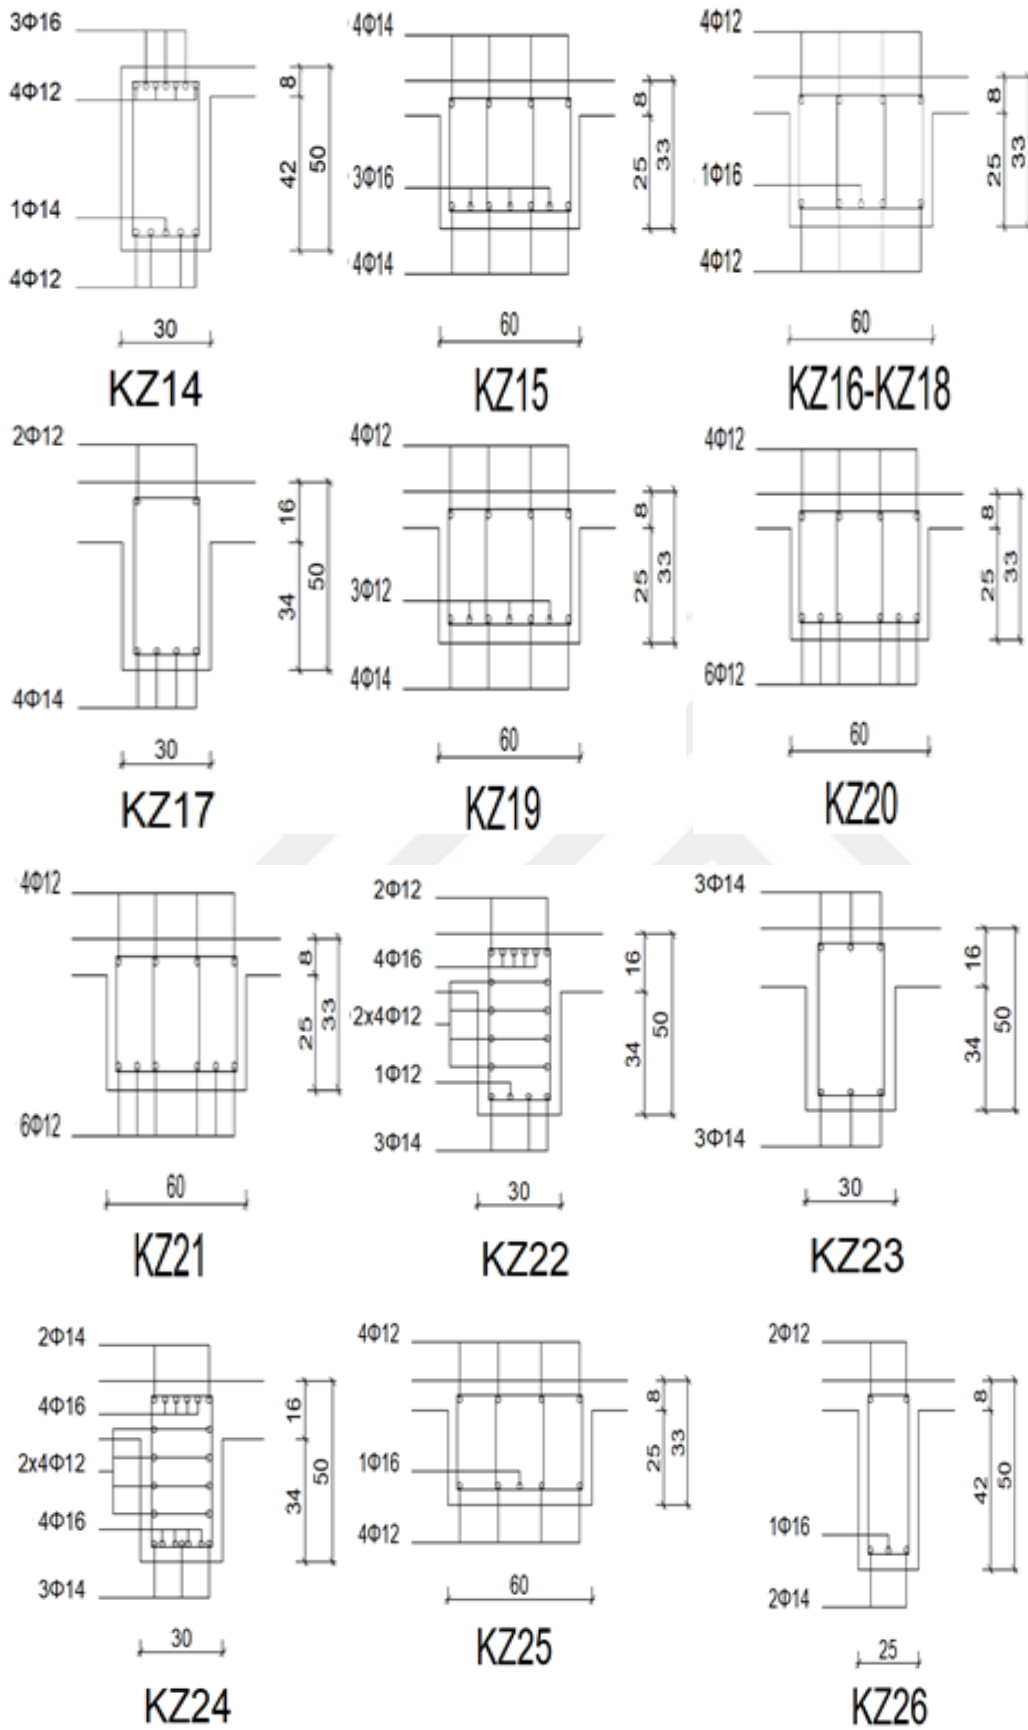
Reinforcement details of beam sections (KZ14-KZ26).
